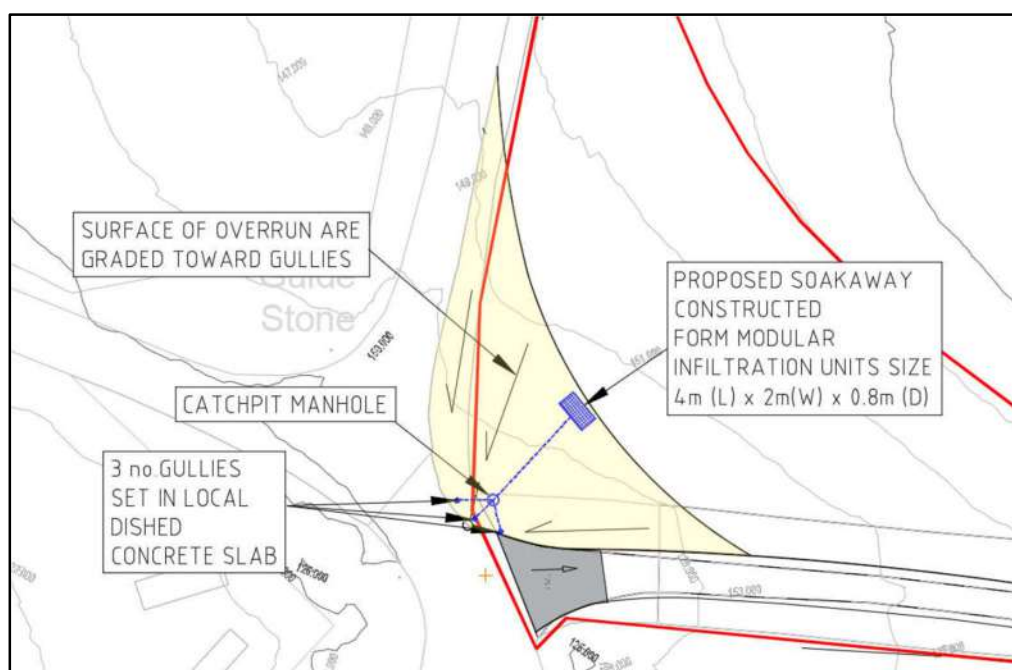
Plan showing Proposed Drainage Works in Overrun Area
